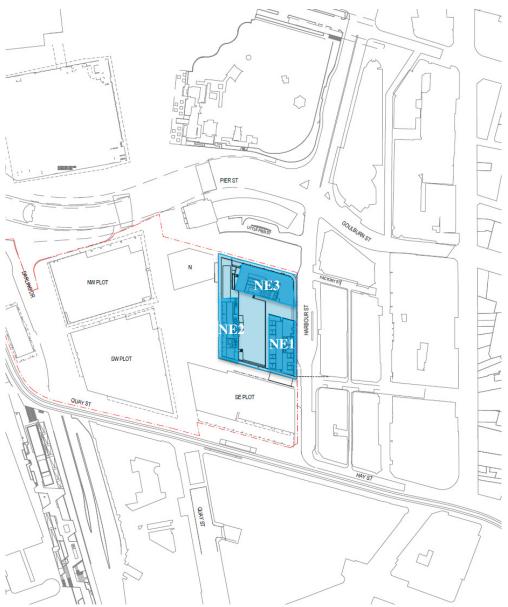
Site plan of North East plot. New tower buildings highlighted in blue. The podium covers the area highlighted in light blue.
